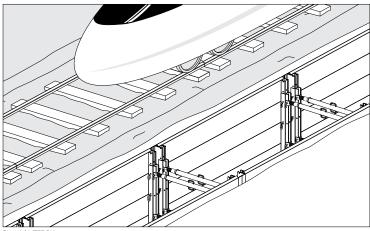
| LITEBOX aluminium trenching system adjacent to railway line
